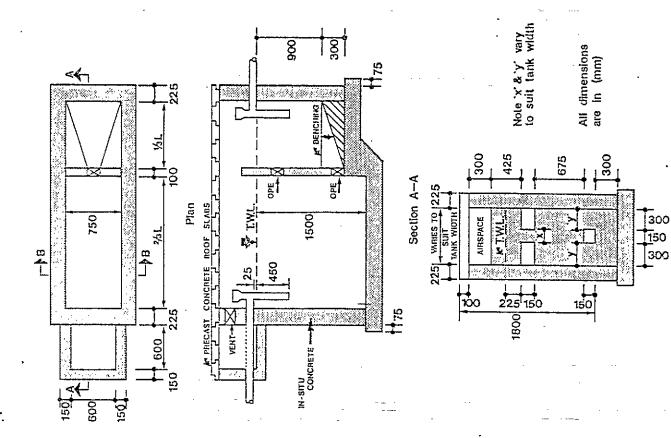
, DETAILS OF CONCRETE SEPTIC TANK CAST IN-SITU
